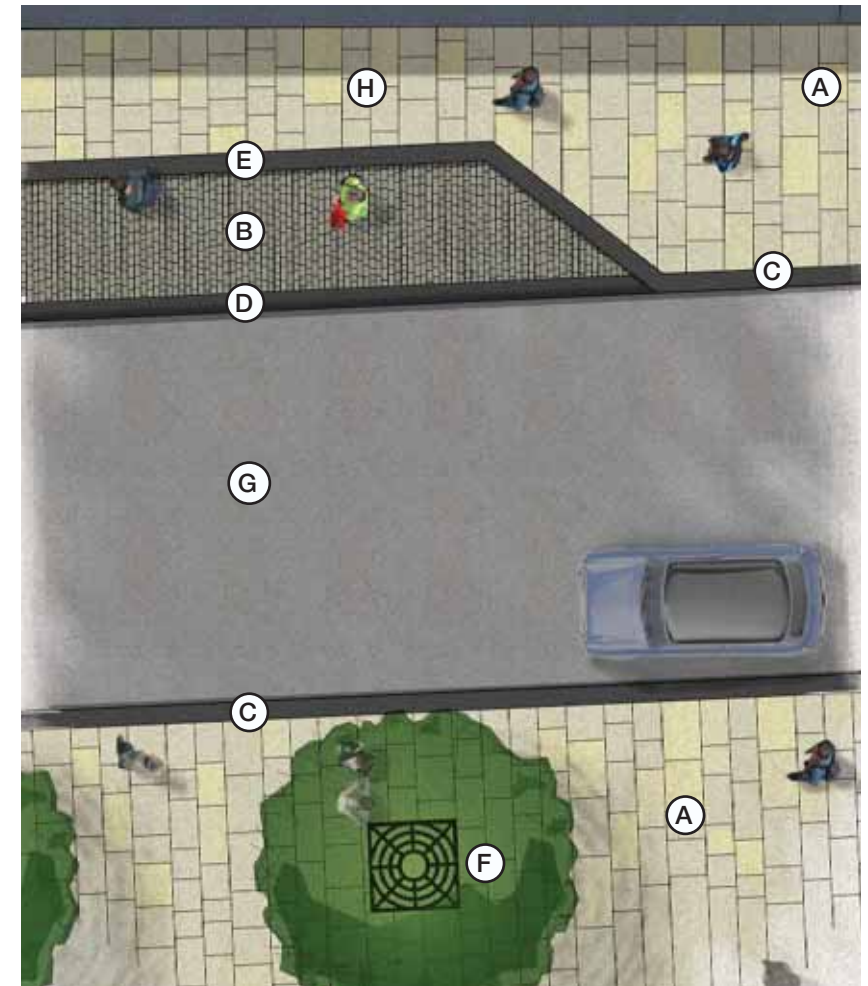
Concept sketch plan illustrating typical layout and materials of the street (Example Parliament Square/Castle Street)
